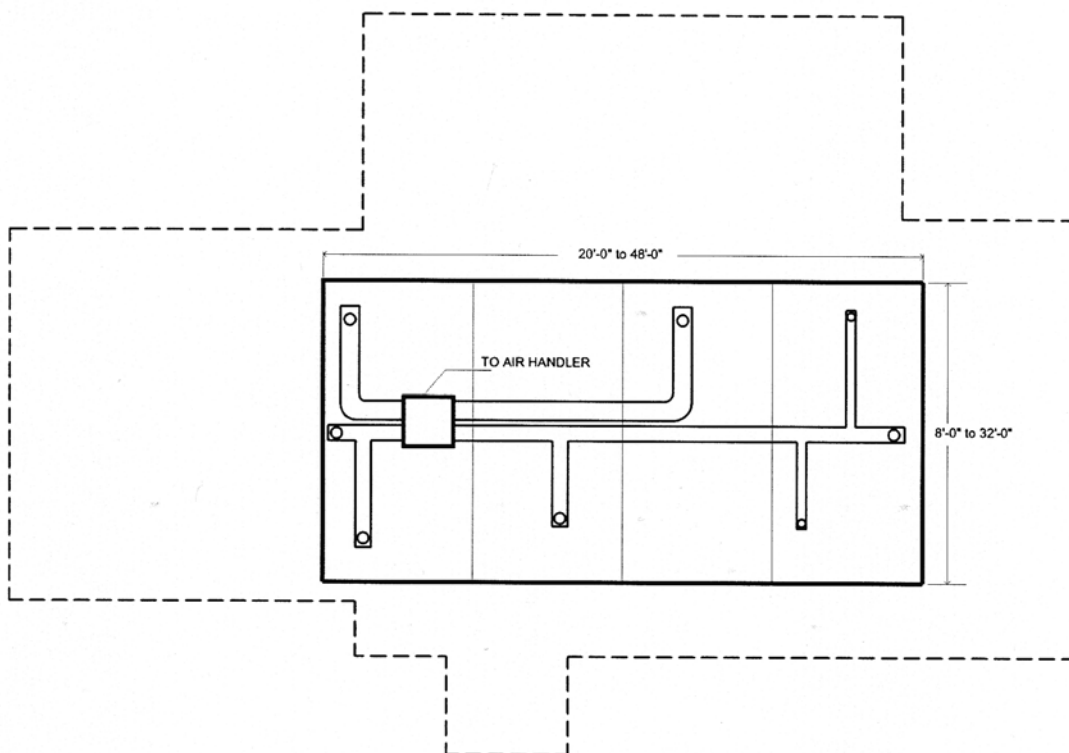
Sample house plan with CAD-designed ductwork array for ceiling truss integration (from Phase I proposal)
